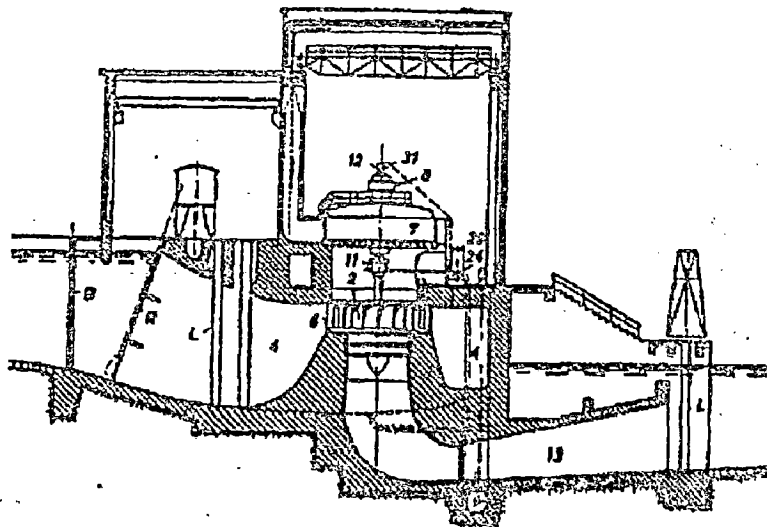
Vertical Section of a Kaplan Turbine Plant
